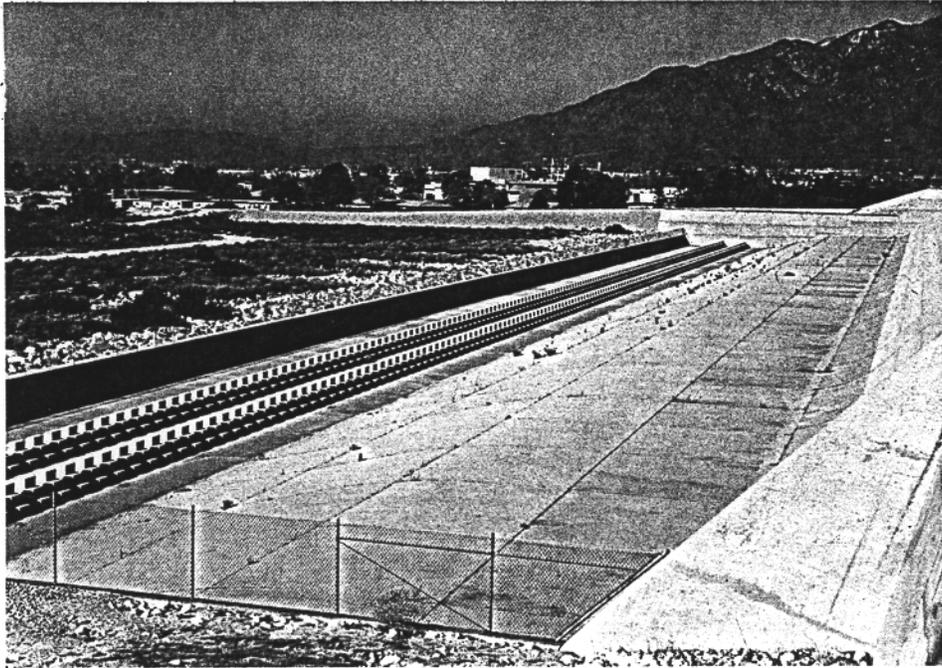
Photographs of the Santa Fe Dam outlet works.
